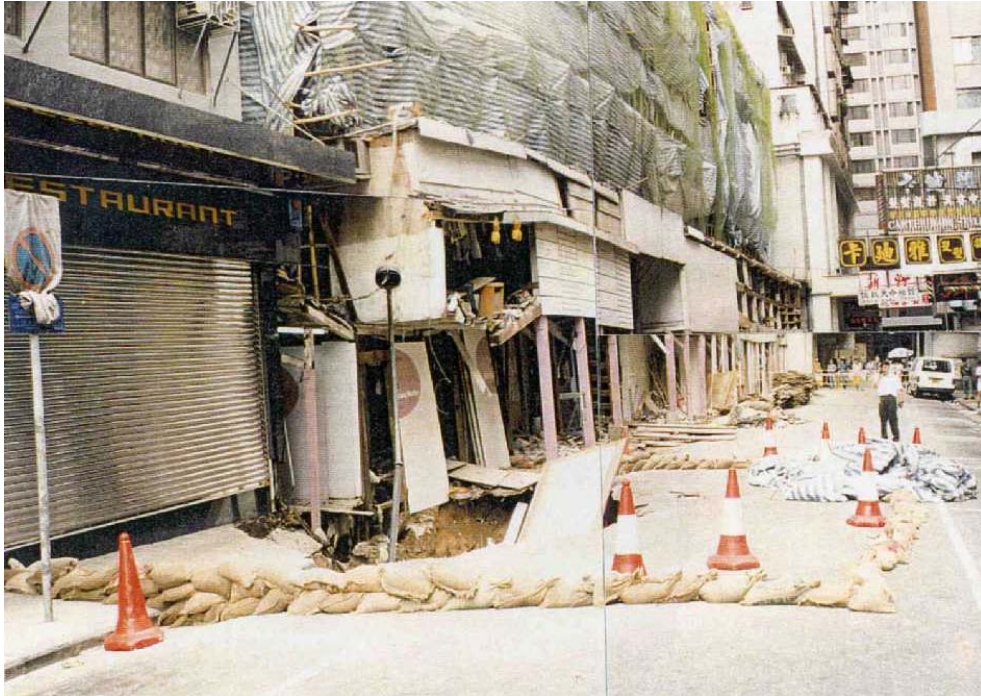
Collapse of Mau Lam Street, Hong Kong June 1991
